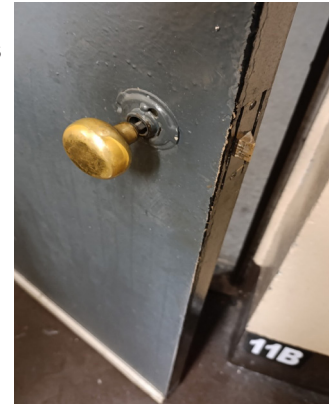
11th-floor Staircase B: broken doorknob preventing the door from fully self-closing and latching
